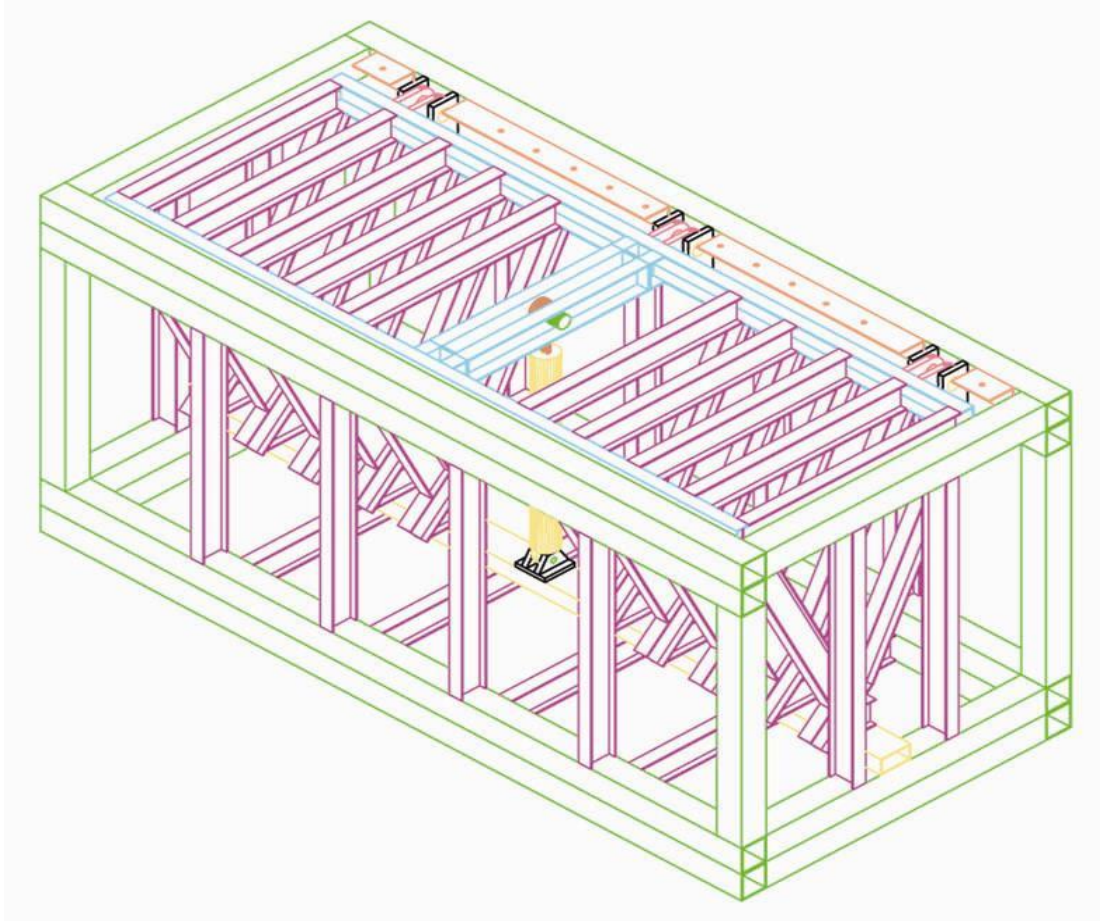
(c) 3-D Construction View (Road Blocker closed)
